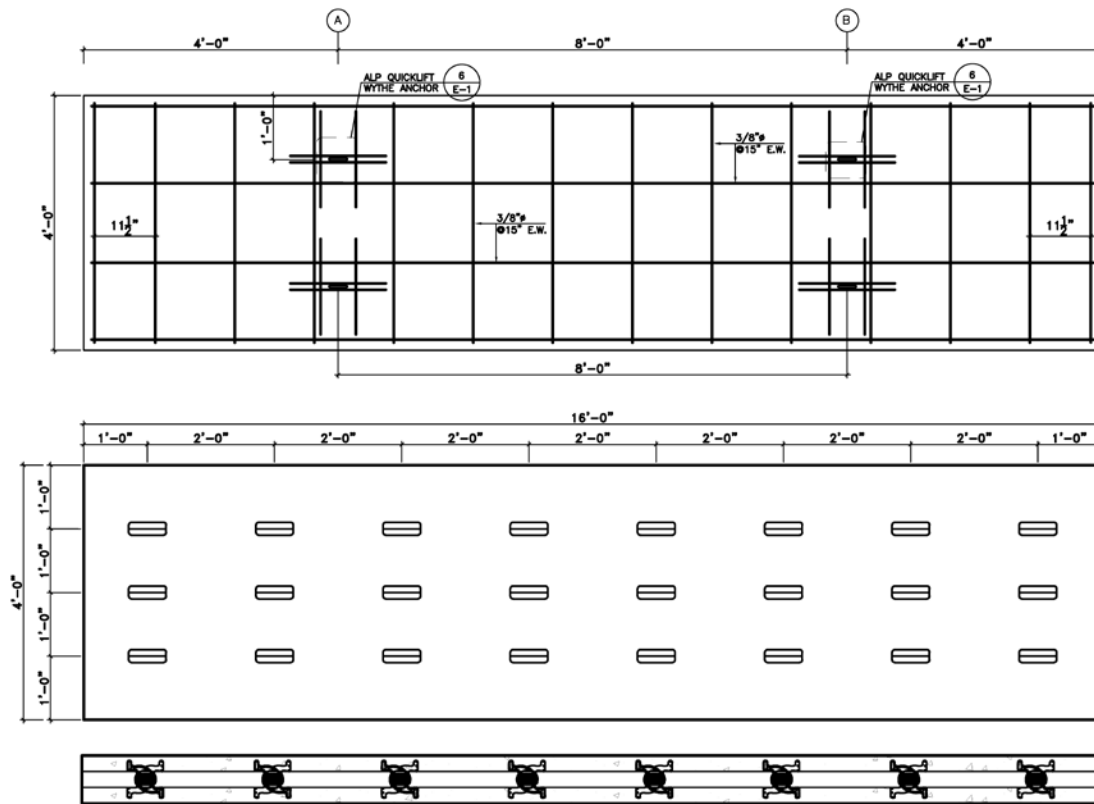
Connector and reinforcement layout on sandwich wall panel
